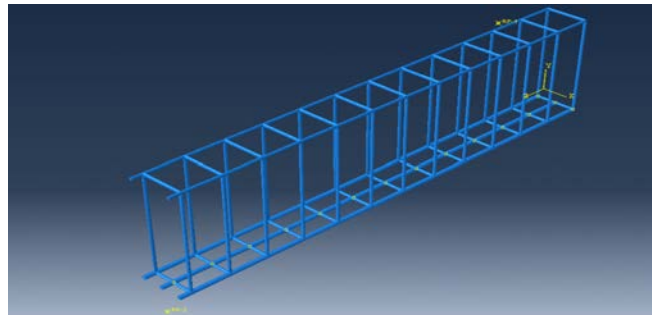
Beam reinforcement (Longitudinal bars and stirrups)
